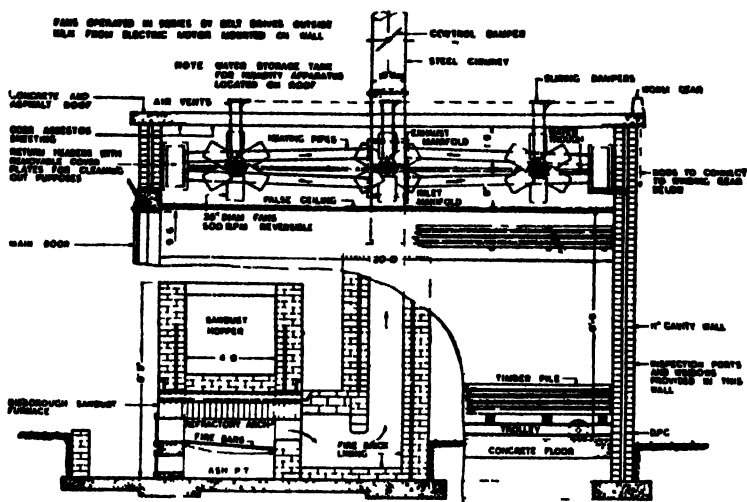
Longitudinal view of furnace heated kiln, and section through furnace
